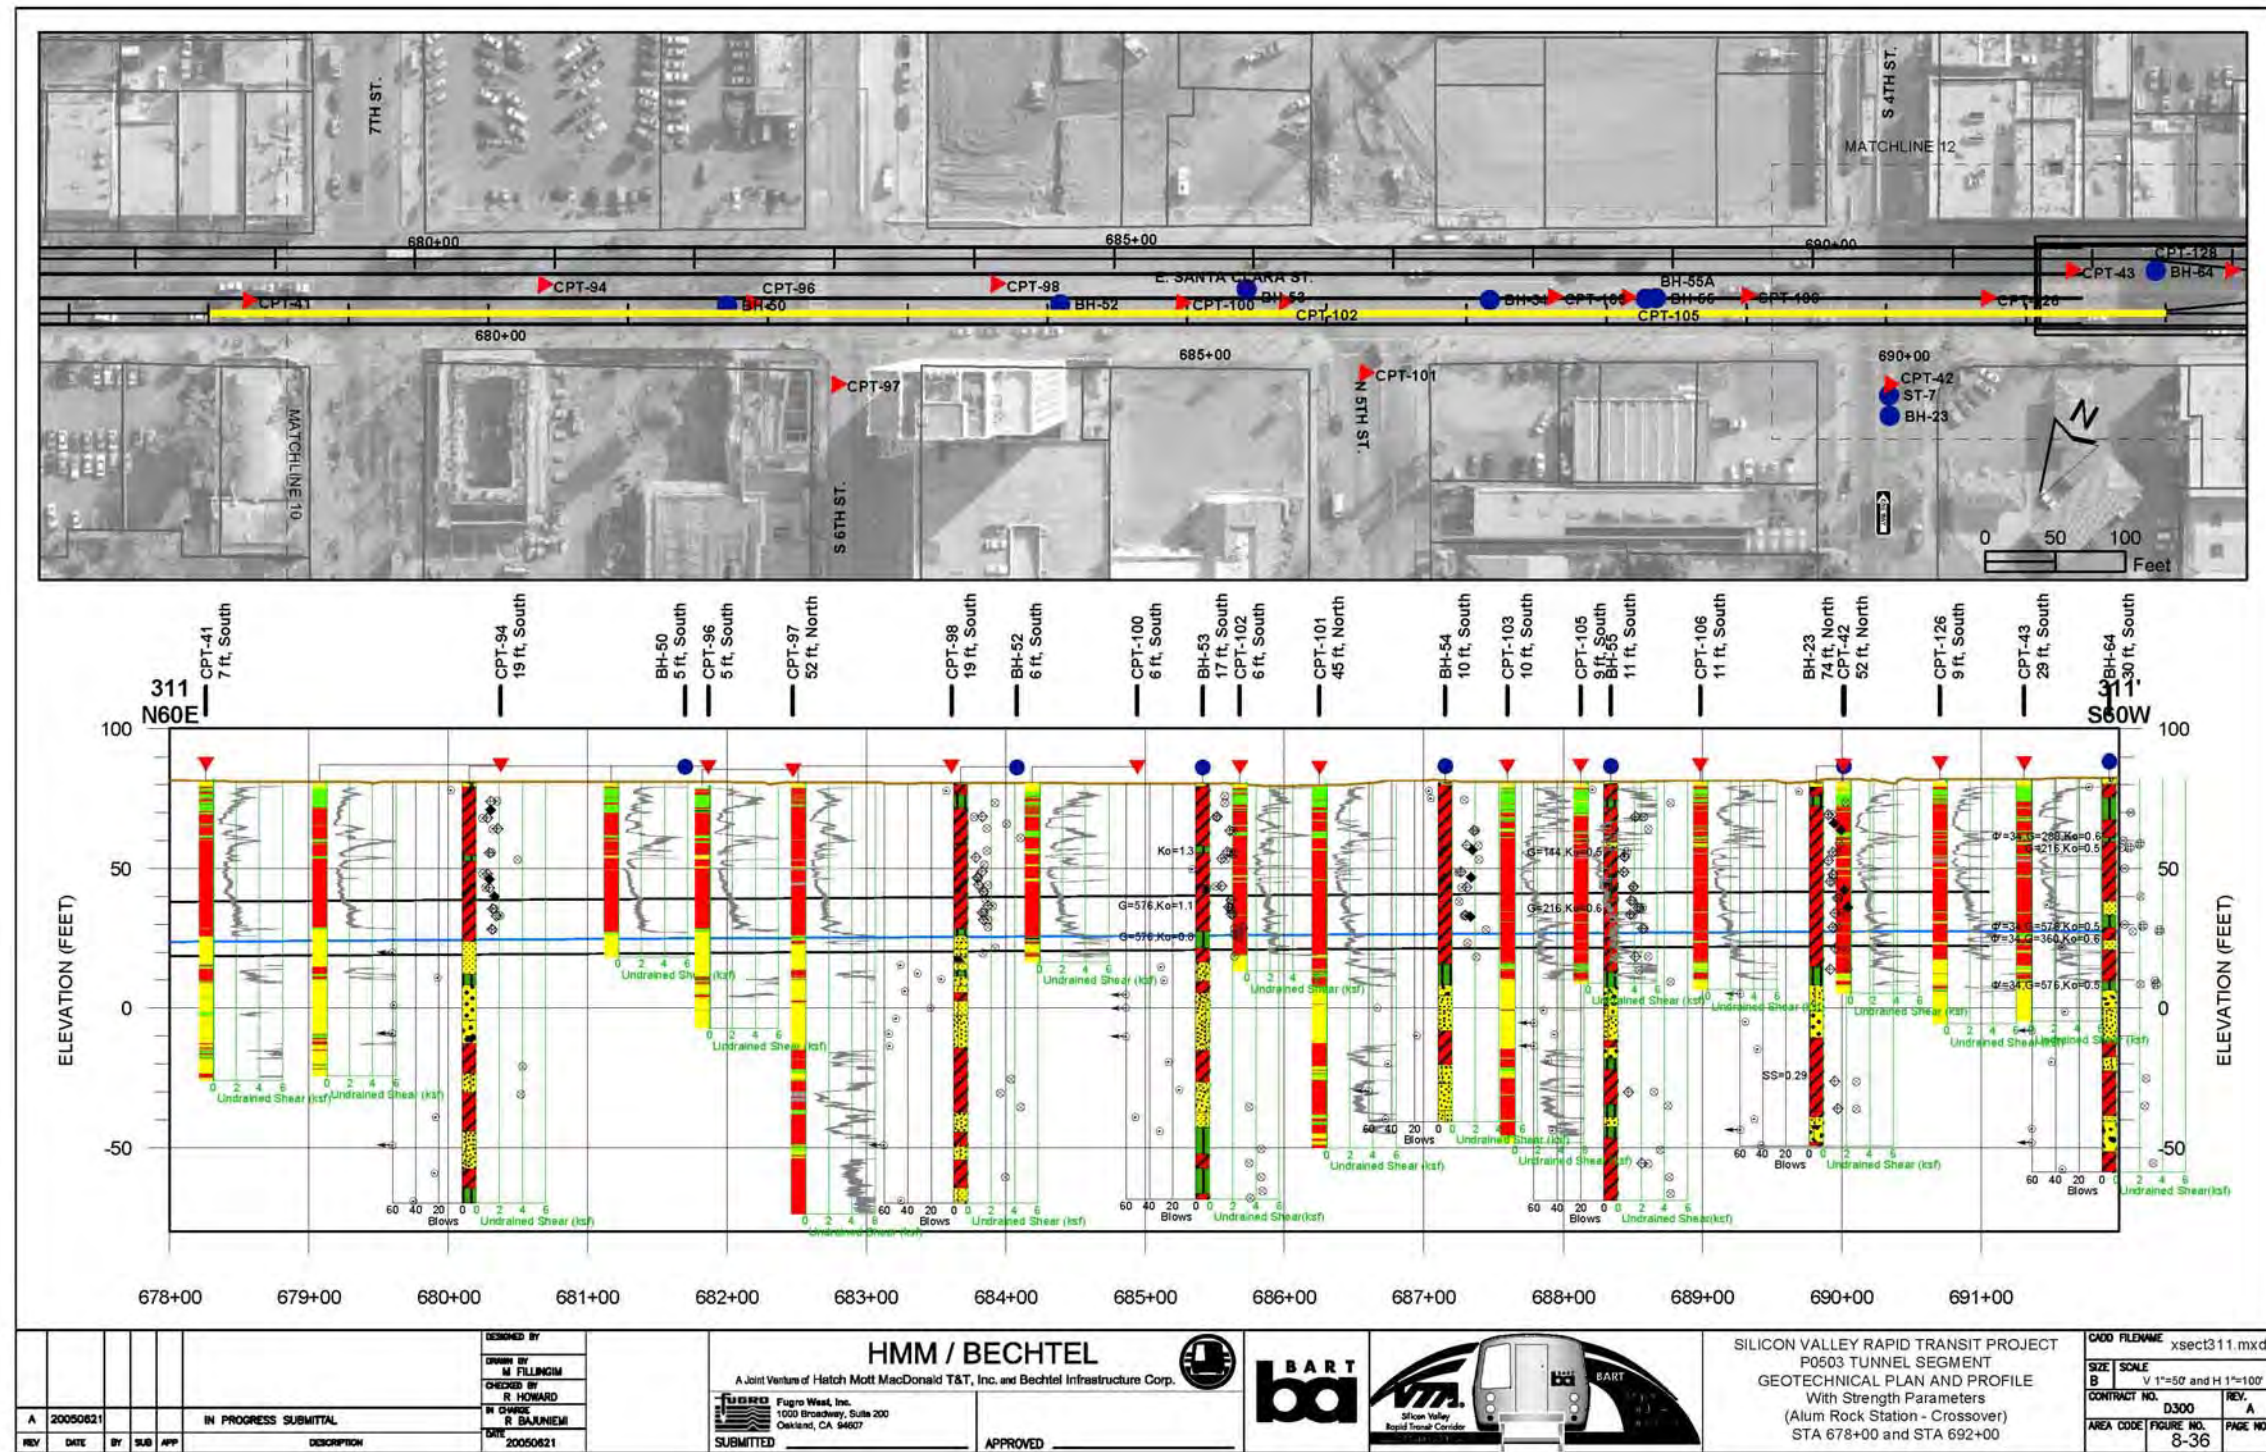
Geotechnical Plan and Profile with Strength Parameters: 678+00 to 692+00.
